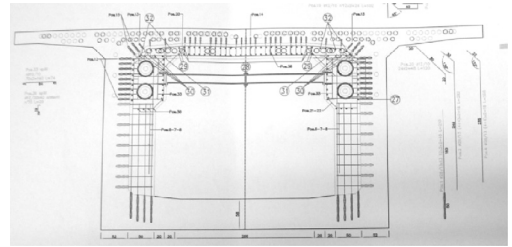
The system devised to anchor the new tendons for post tensioning to the original girder: details.
